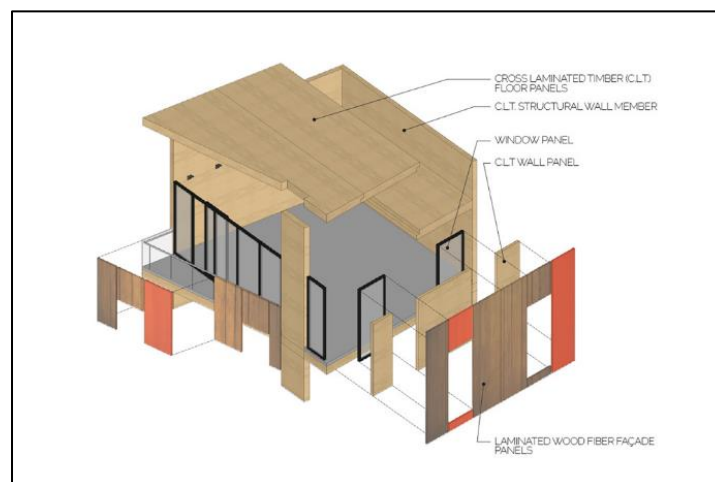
X-Lam Structure (Source: Jasontran, 2020)
